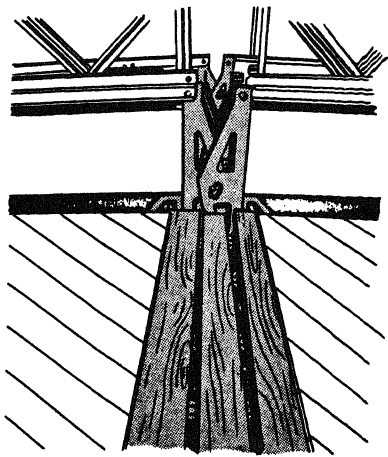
Planks on cut stringers for filling gap between bays when bays are connected with special connecting posts. Note hub guards and special connecting posts.
